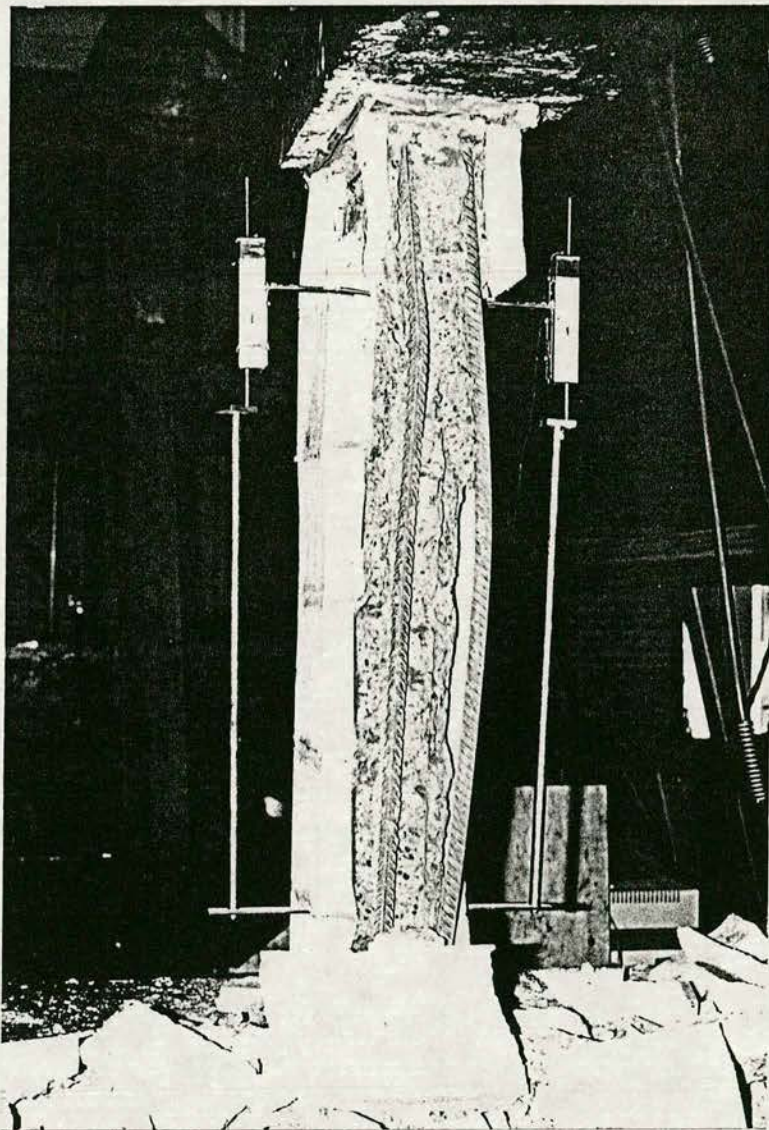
Typical mode of failure of full-block masonry columns reinforced with vertical bars only.
